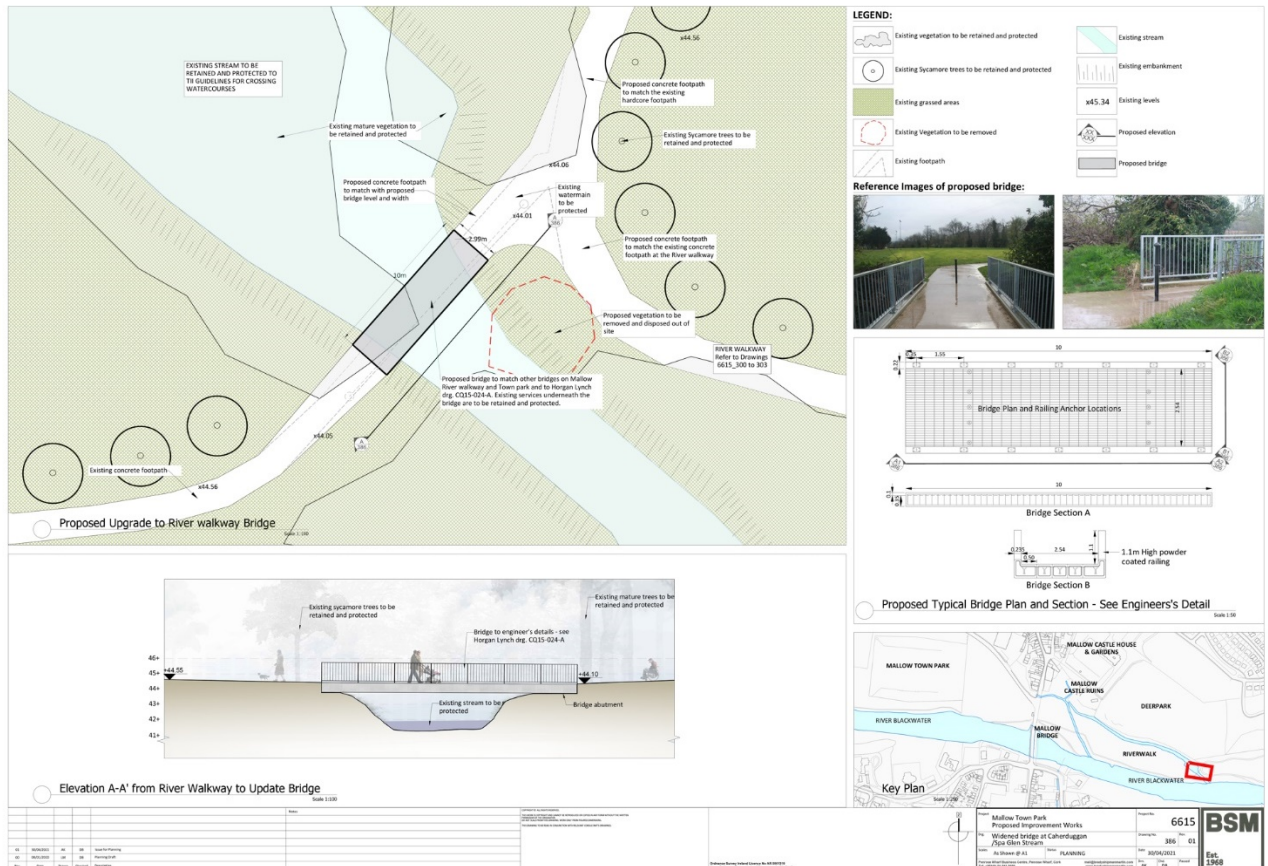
Widened bridge crossing of Caherduggan/Spa Glen Stream
